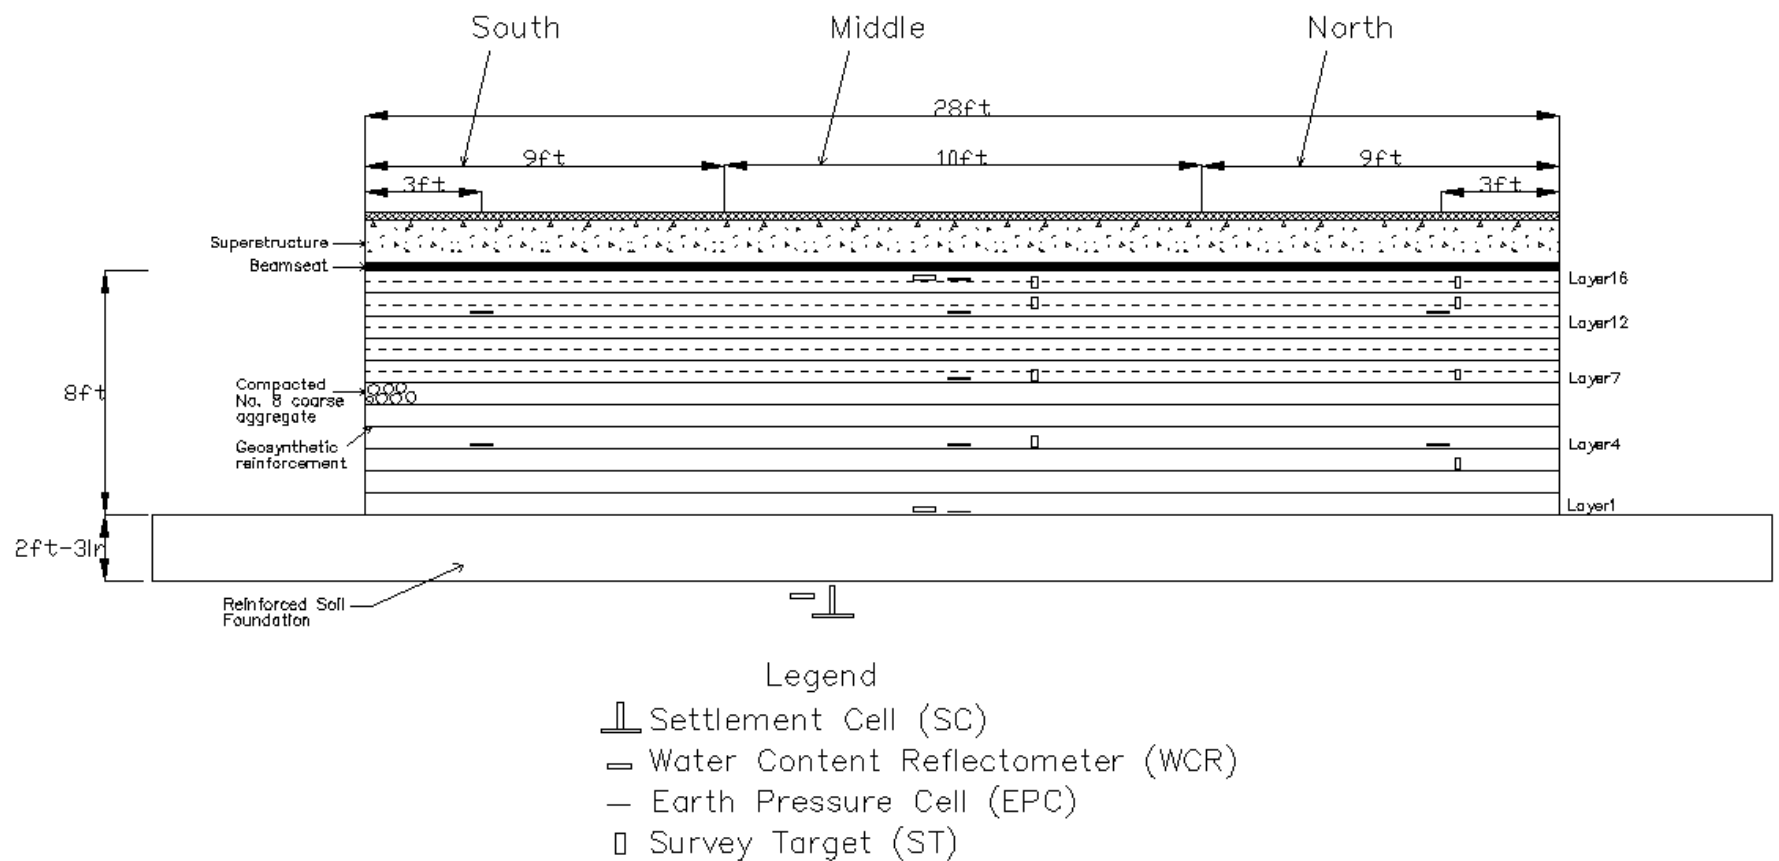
Layout of instrumentation in the transverse direction in abutment B
